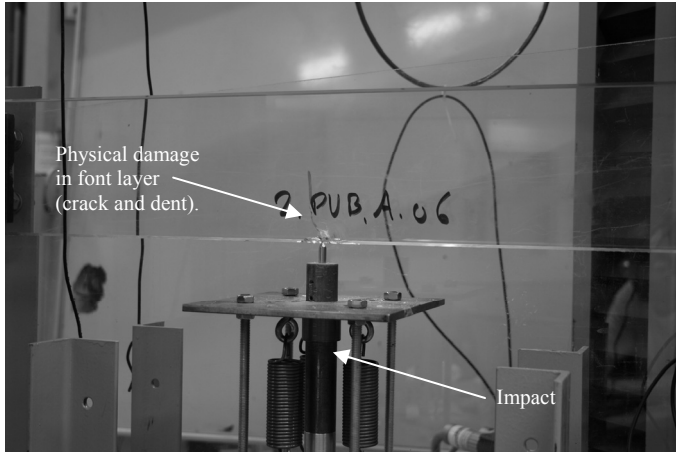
Double layer, annealed glass specimen in 4-point bending set-up, after first impact (in front layer).
